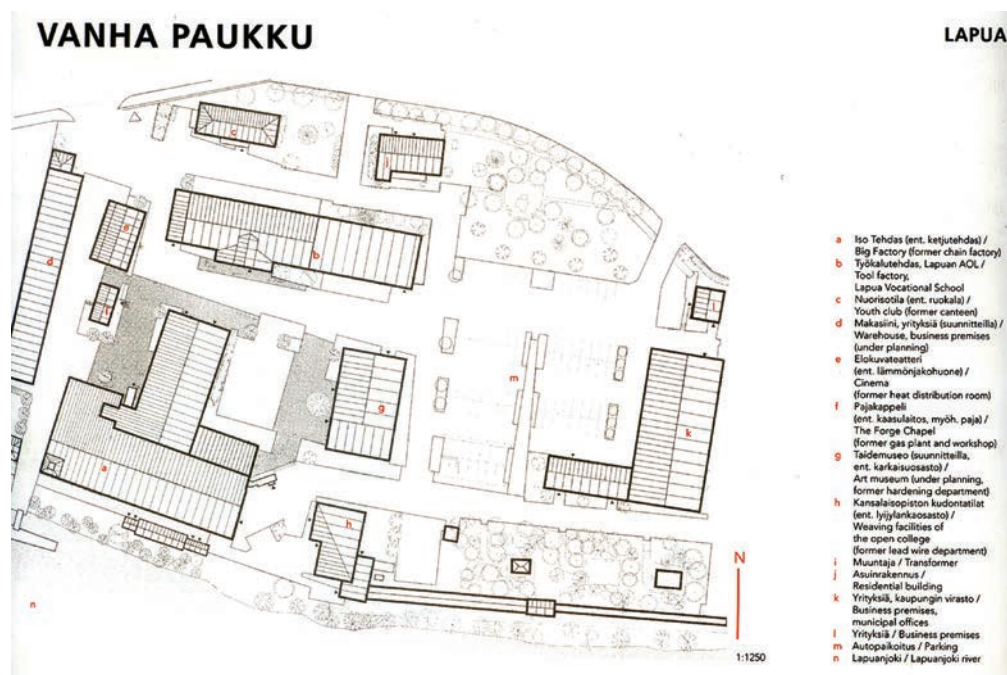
The site plan of Old Paukku in 1999. Lapua Town Archives.
